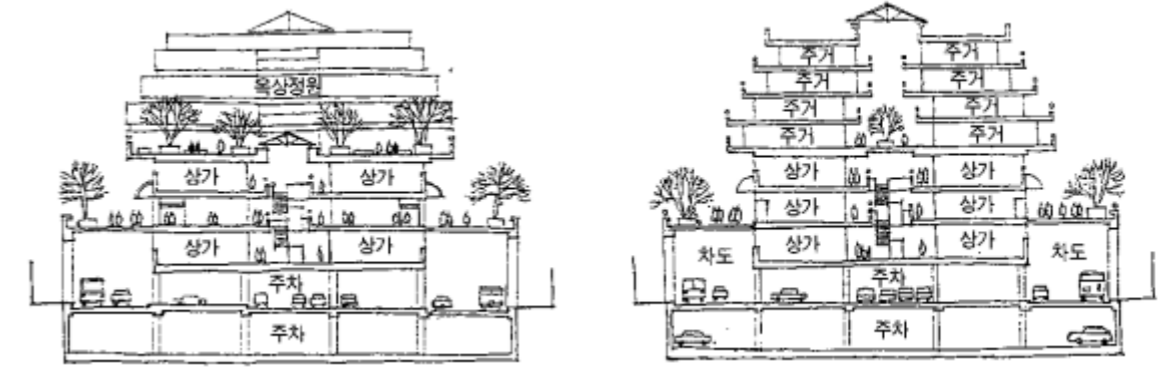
Conceptual Section Drawings of Sewoon Sangga
